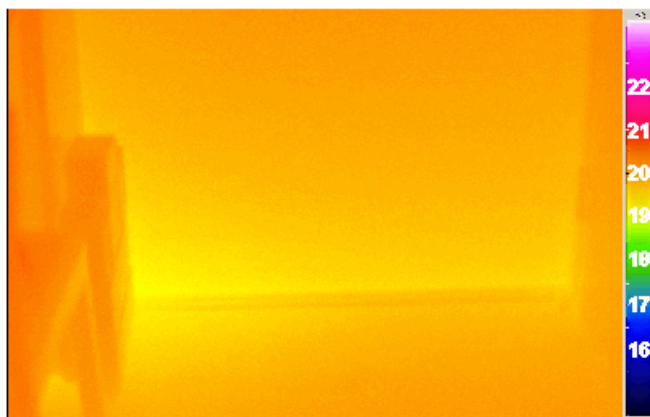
Infrared picture documenting the thermal separation of the external wall from the concrete basement floor - there is no significant temperature drop. [41]
